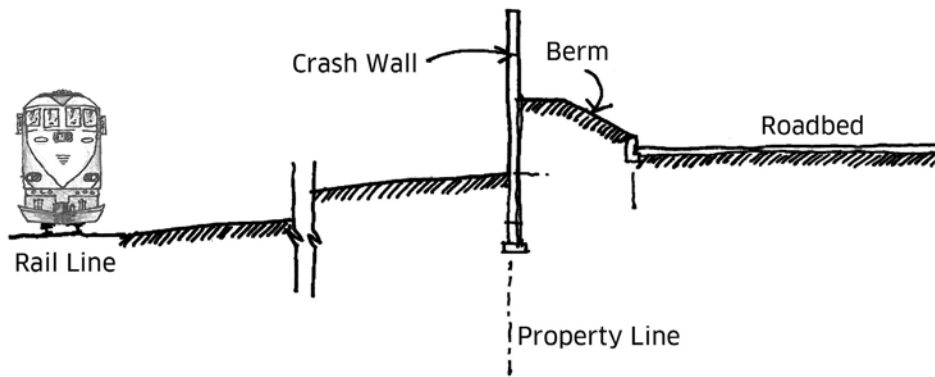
// EXAMPLE CONFIGURATION OF A CRASH BERM
